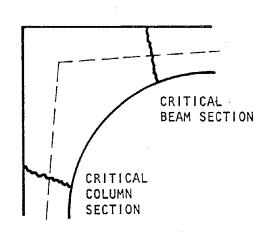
CRITICAL BEAM AND COLUMN SECTIONS
